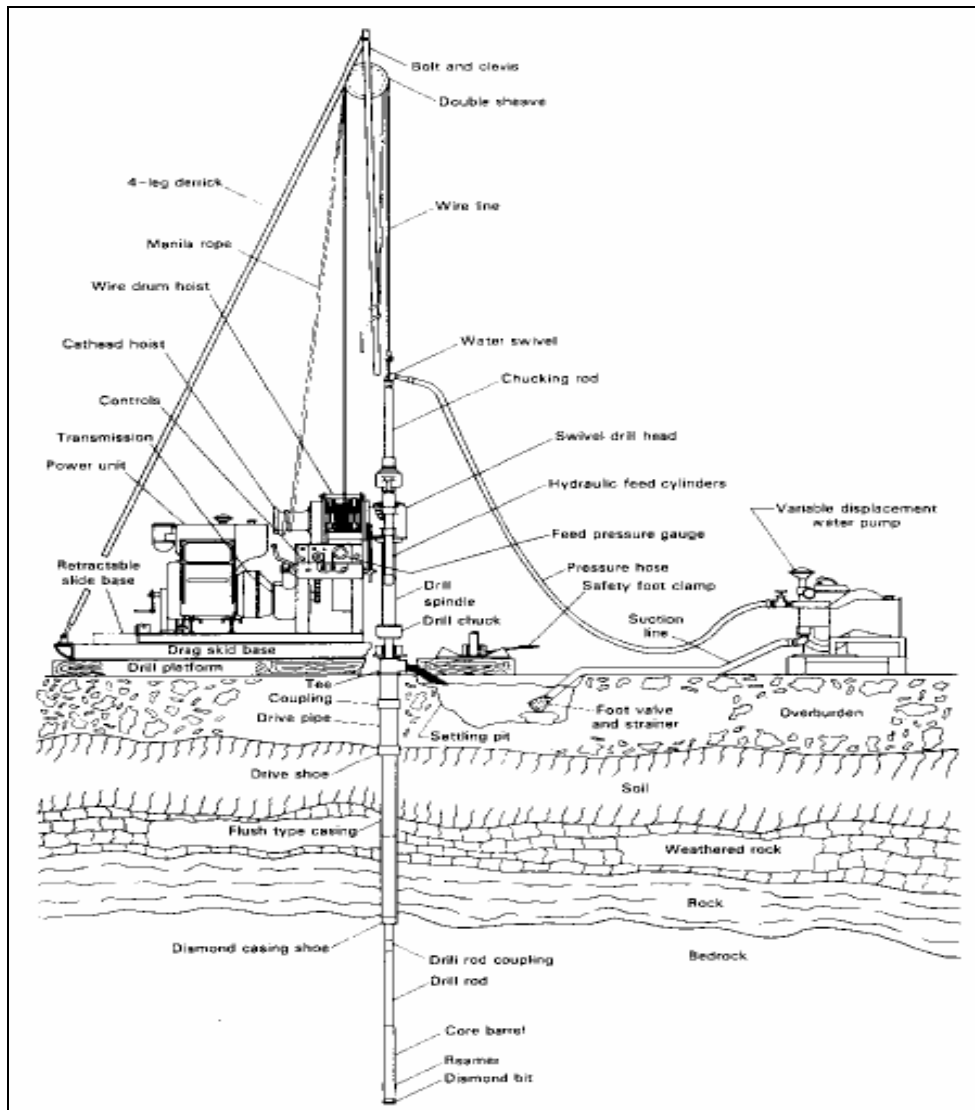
Typical diamond drilling rig for exploration. (Acker Drill Co., Inc.)
